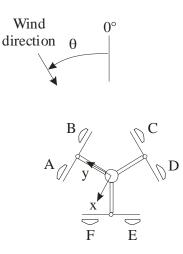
Panel layout and axis notation for the Mercedes head frame
